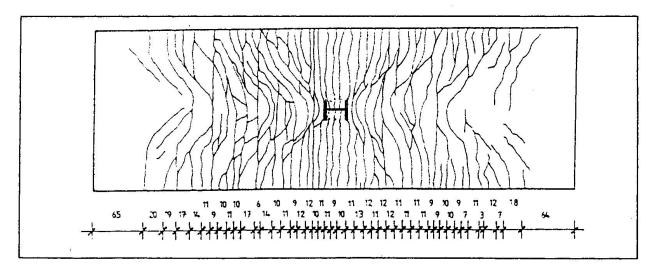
Crack pattern at the end of the test with a reinforcement ratio of 1.3 %
